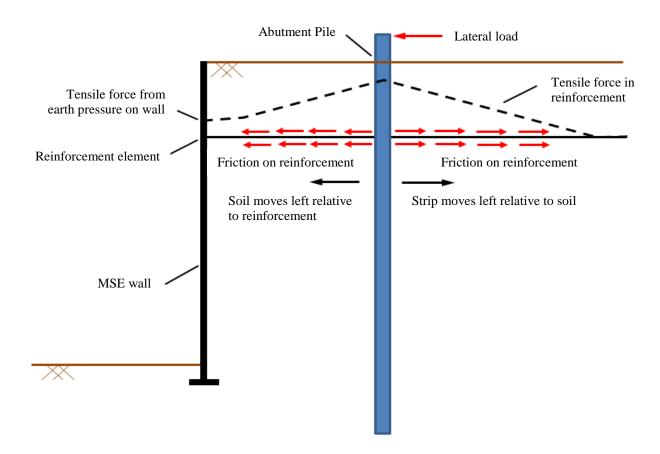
Interaction of soil and MSE wall reinforcement when pile is laterally loaded.
